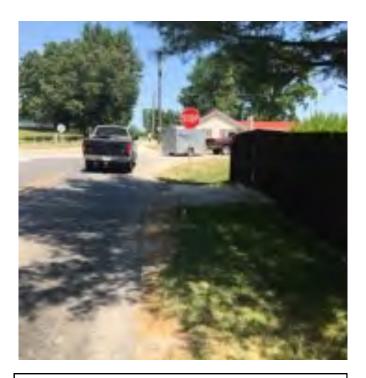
Facing north — view of CR 29 and U.S. 20 intersection.
